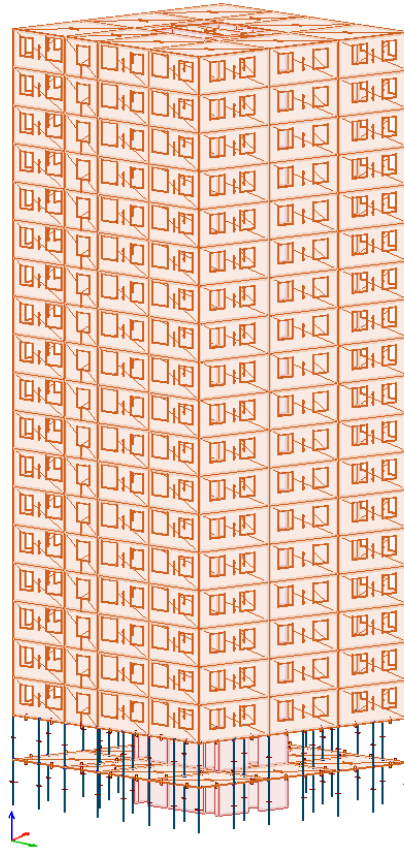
Hybrid timber building with GLT columns and beams at lowest two floors.
